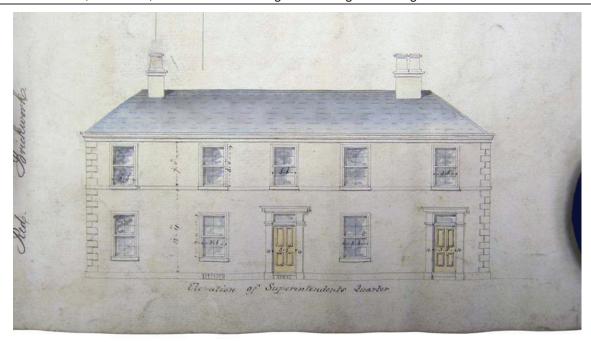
Undated elevation of proposed 'Superintendents Quarter' (CAC(B) BDKF Plans/4, nd)
